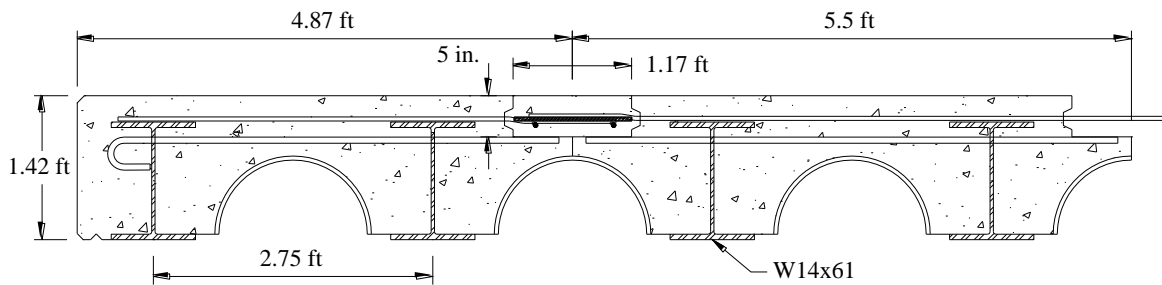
Cross-section of precast deck units for demonstration project in BHC, Iowa
